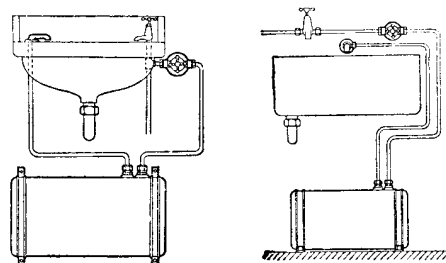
Pipe connections for, left, basin using control valve and pillar bib and, right, sink using control valve and back-plate bib
